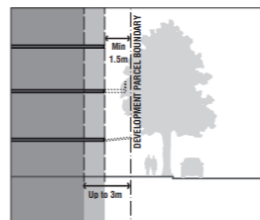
Min 1.5m up to Max 3m Street Setback Section
